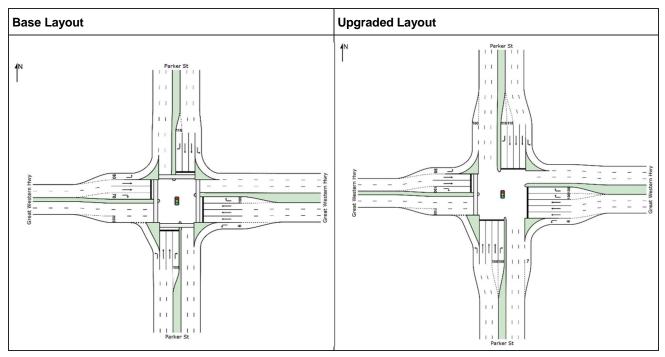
2021 without Links Road extension - Great Western Highway/Parker Street
